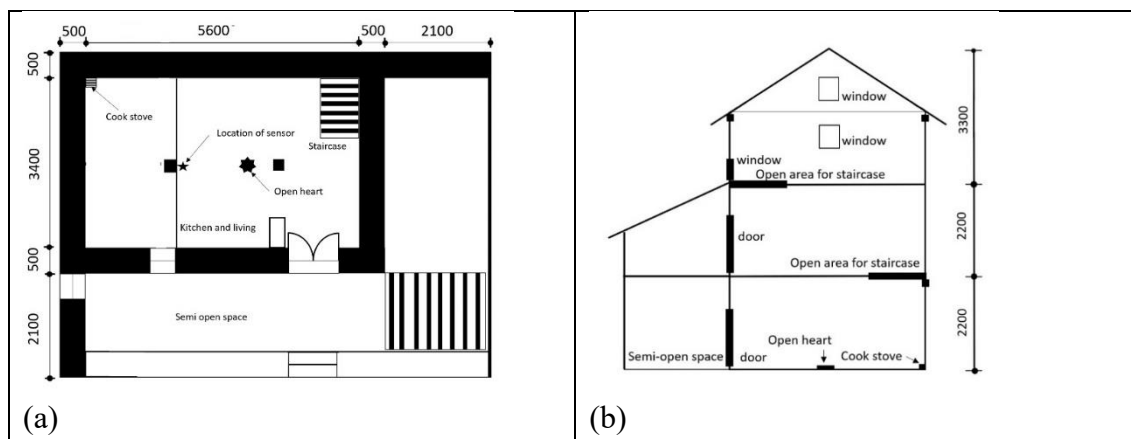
Design of a typical house in investigated area: (a) Plan view and (b) Sectional view (unit: mm).
